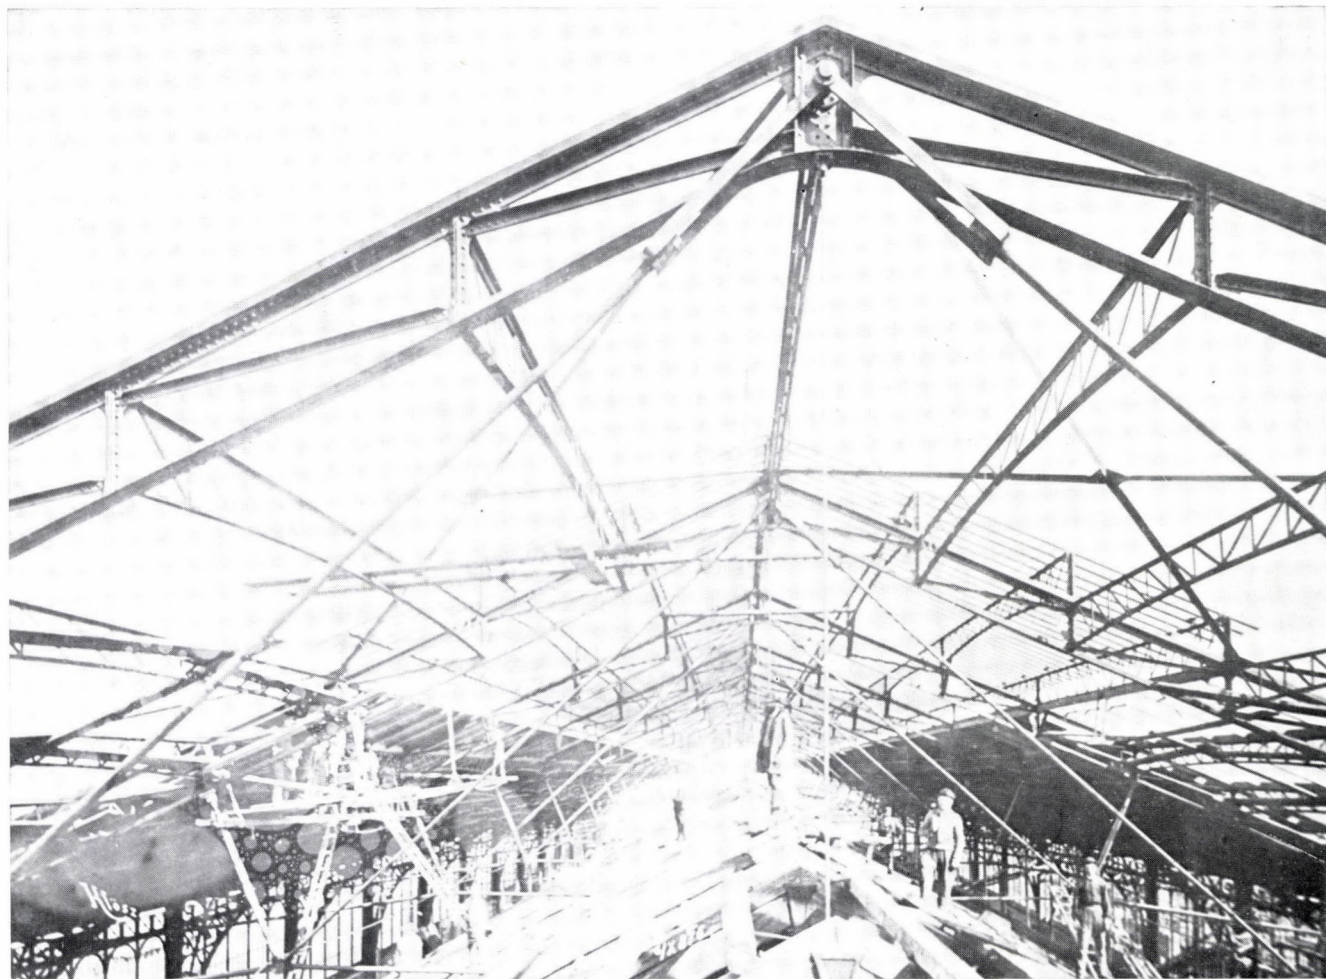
The main hall steel structure under construction, with the roof of the old station hall underneath, used partly as a scaffold
